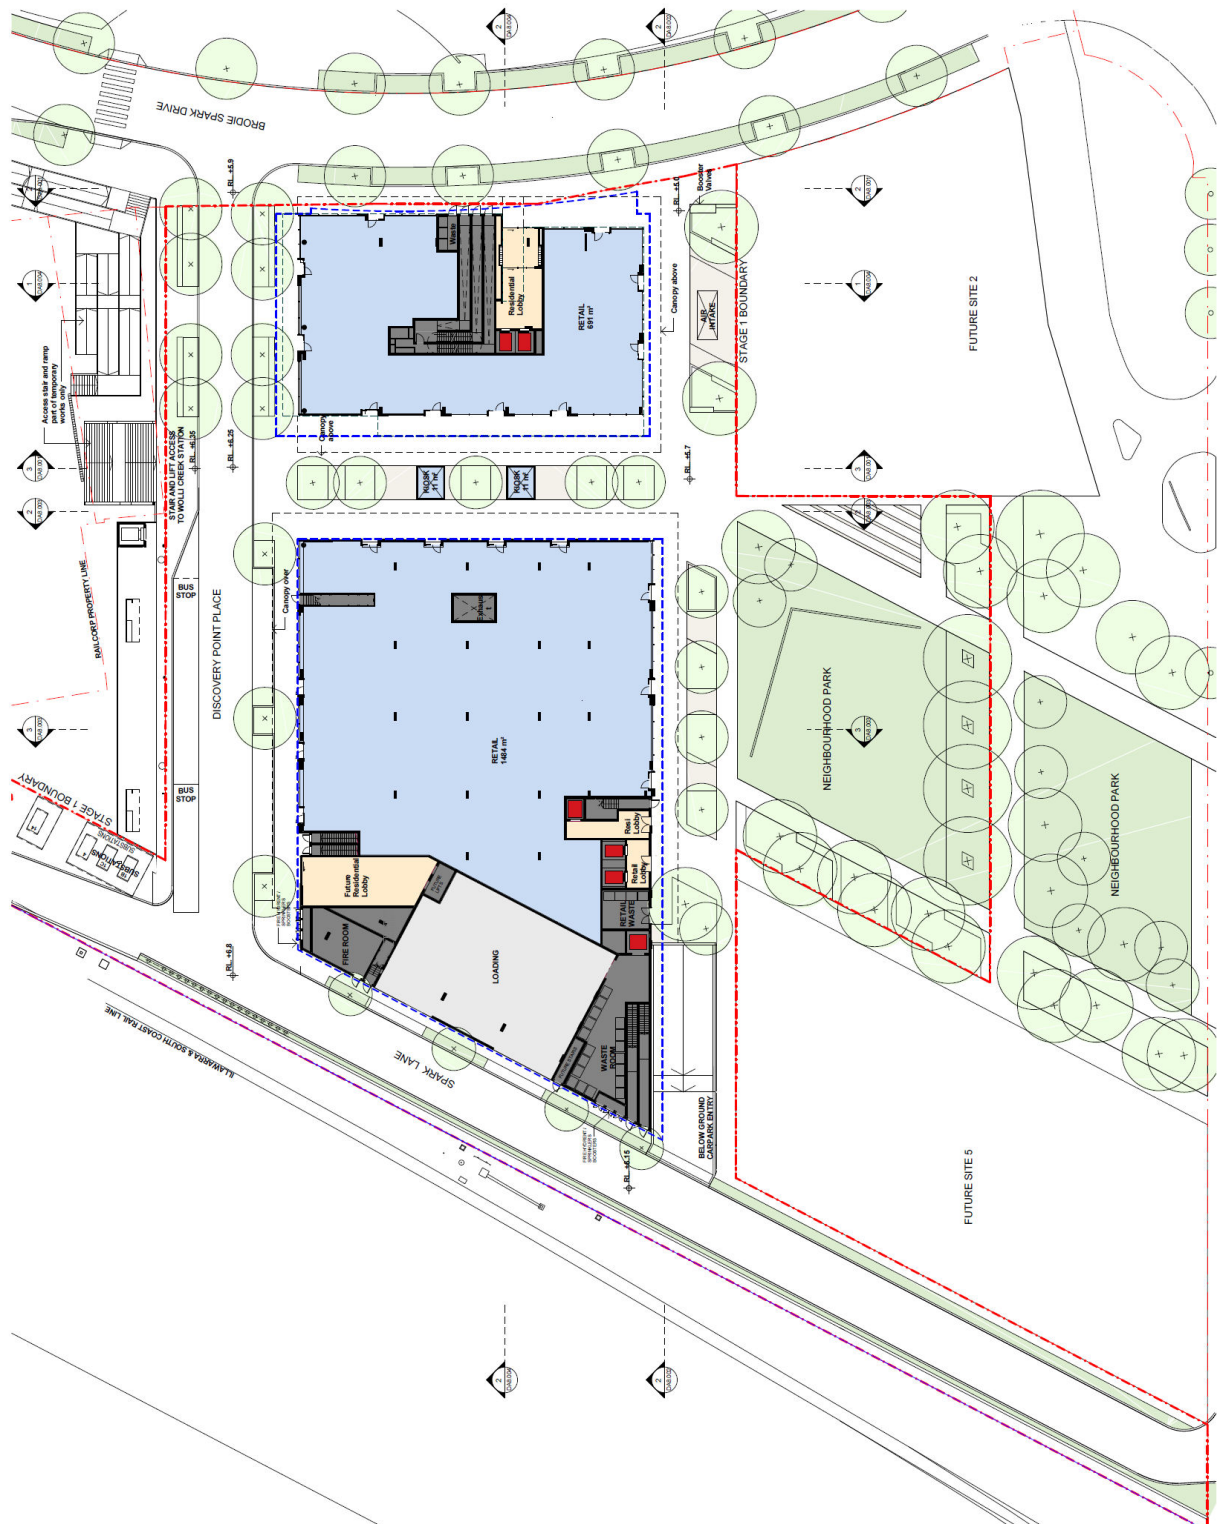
Proposed Stage 1 Ground Level Plan (Source: Bates Smart)
